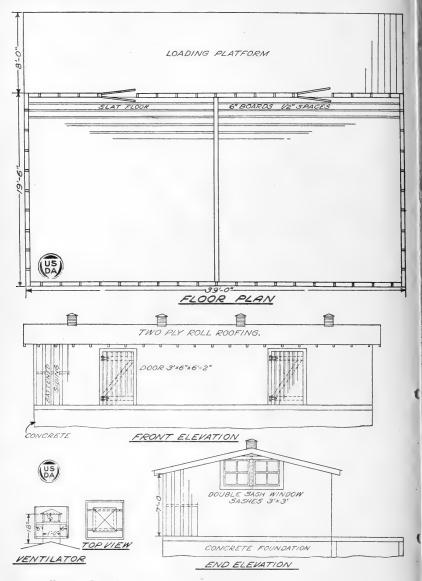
Plan for a Satsuma orange coloring house of 2-car capacity.
